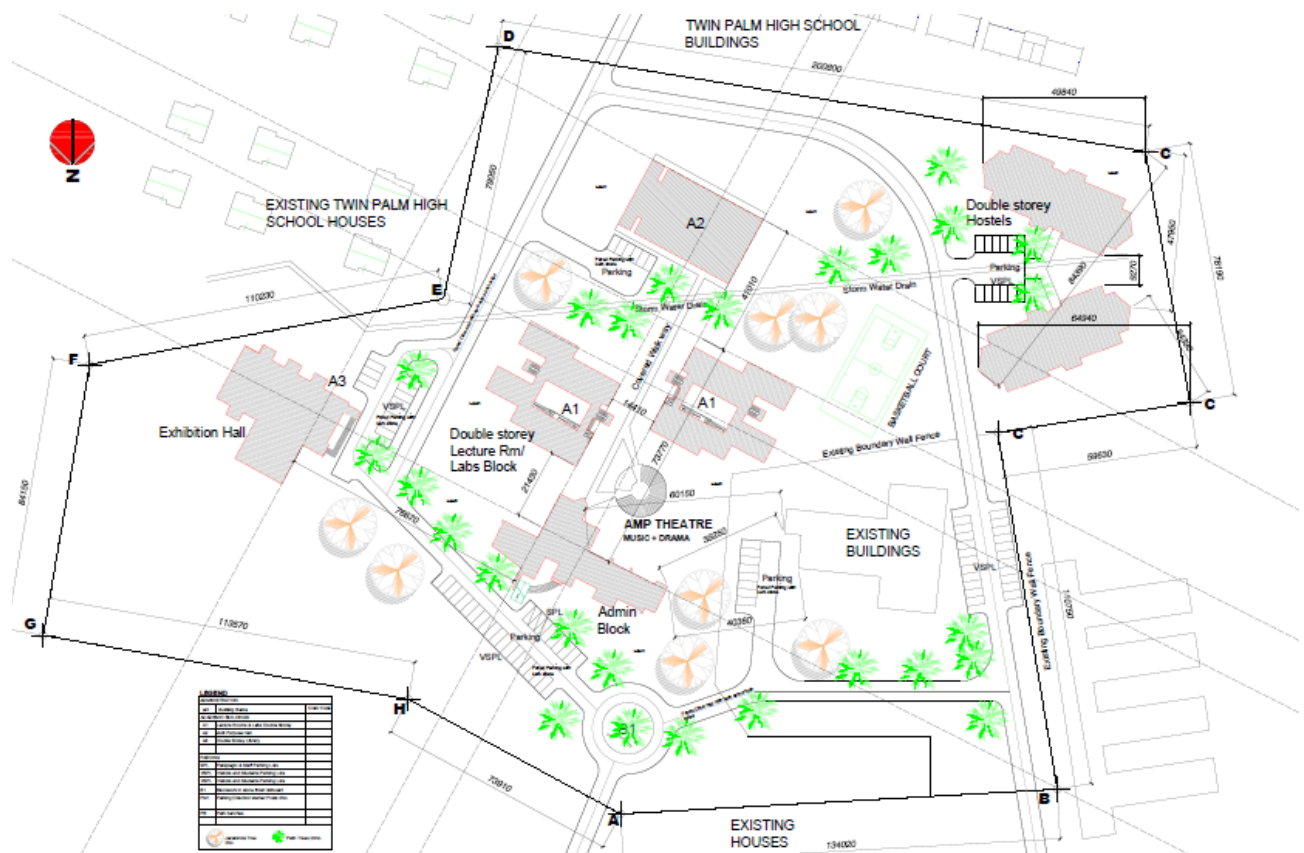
Site layout of the Proposed Development (Source: ZEPIU)
